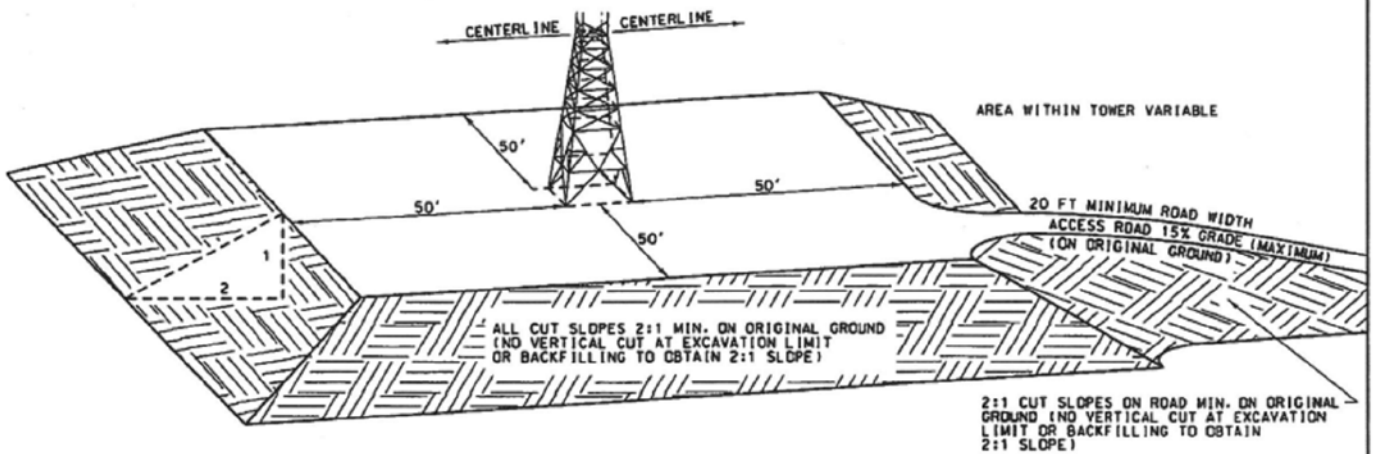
SHOWS THE TYPICAL LIMITS OF EXCAVATION AROUND BPA STEEL LATTICE TOWERS.
